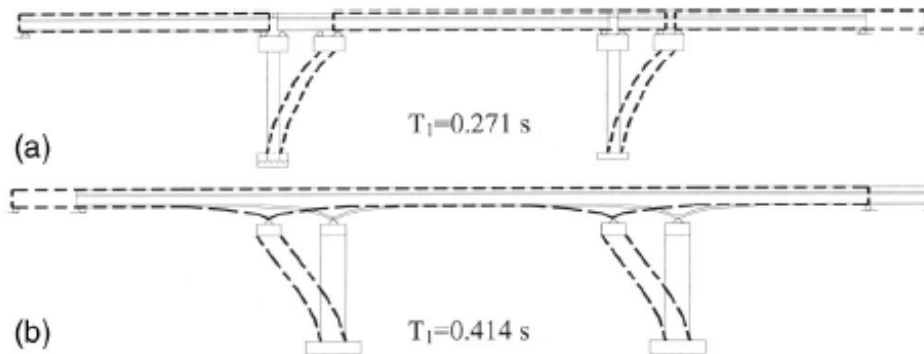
Mode Shapes for (a) Multispan Simply Supported Steel Girder Bridge and (b) Multispan Continuous Steel Girder Bridge (after DesRoches et al., 2004)
